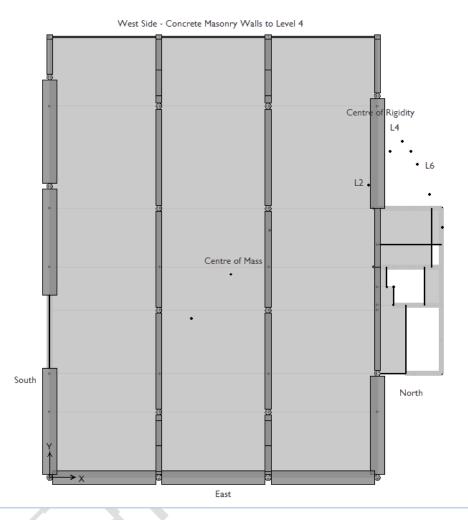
Centre of Mass and Centres of Rigidity for each Floor (ETABS model 1b - Concrete Shear Walls and Concrete Masonry Walls as seismic system)
